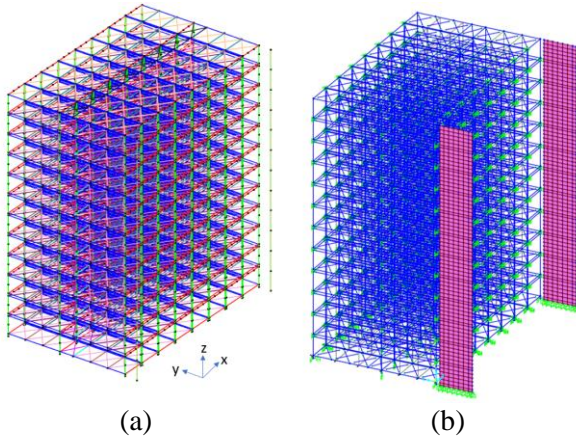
FE models of the twelve-story modular building: (a) OpenSees (with nonlinear fiber element shear walls); (b) SAP2000 (with nonlinear shell element shear walls)
